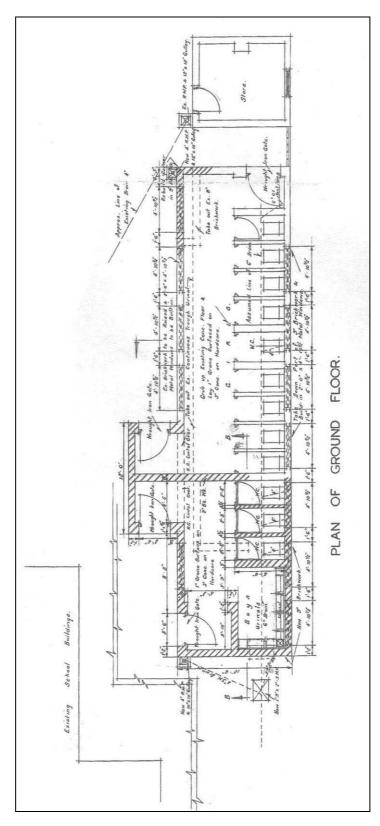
Ground floor plan of alterations to toilet block, dated November 1949
